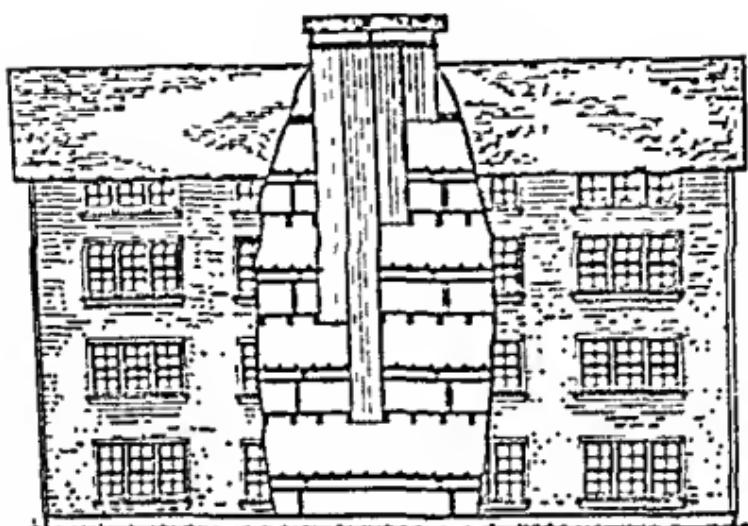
The ceiling outtake-flue system of ventilation for a cold or un-insulated walled house. Each floor has a separate flue. From *Cornell Ext. Bull. 315.
